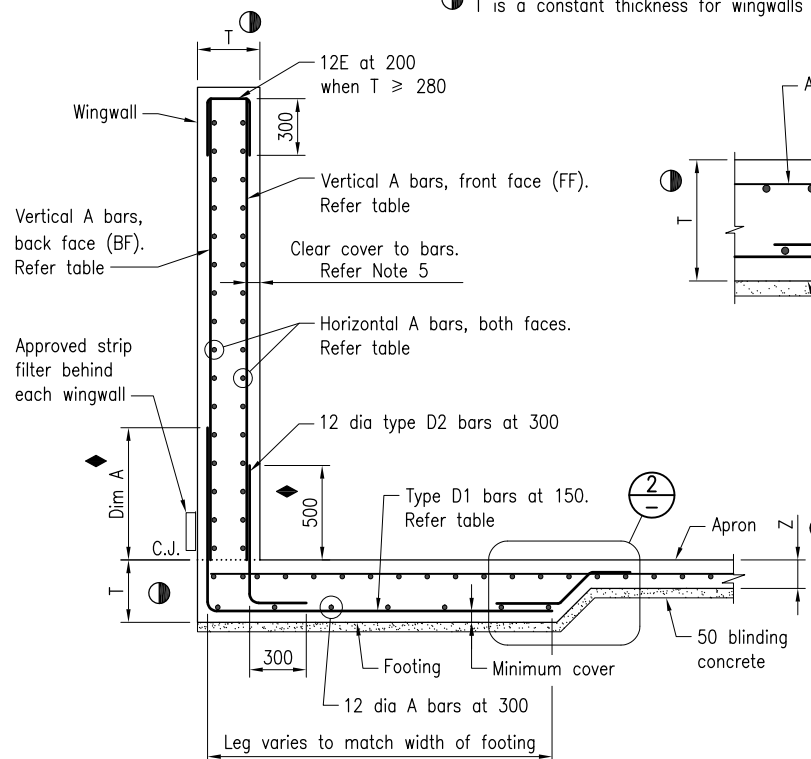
HEADWALL FOR SLAB LINK CULVERTS
